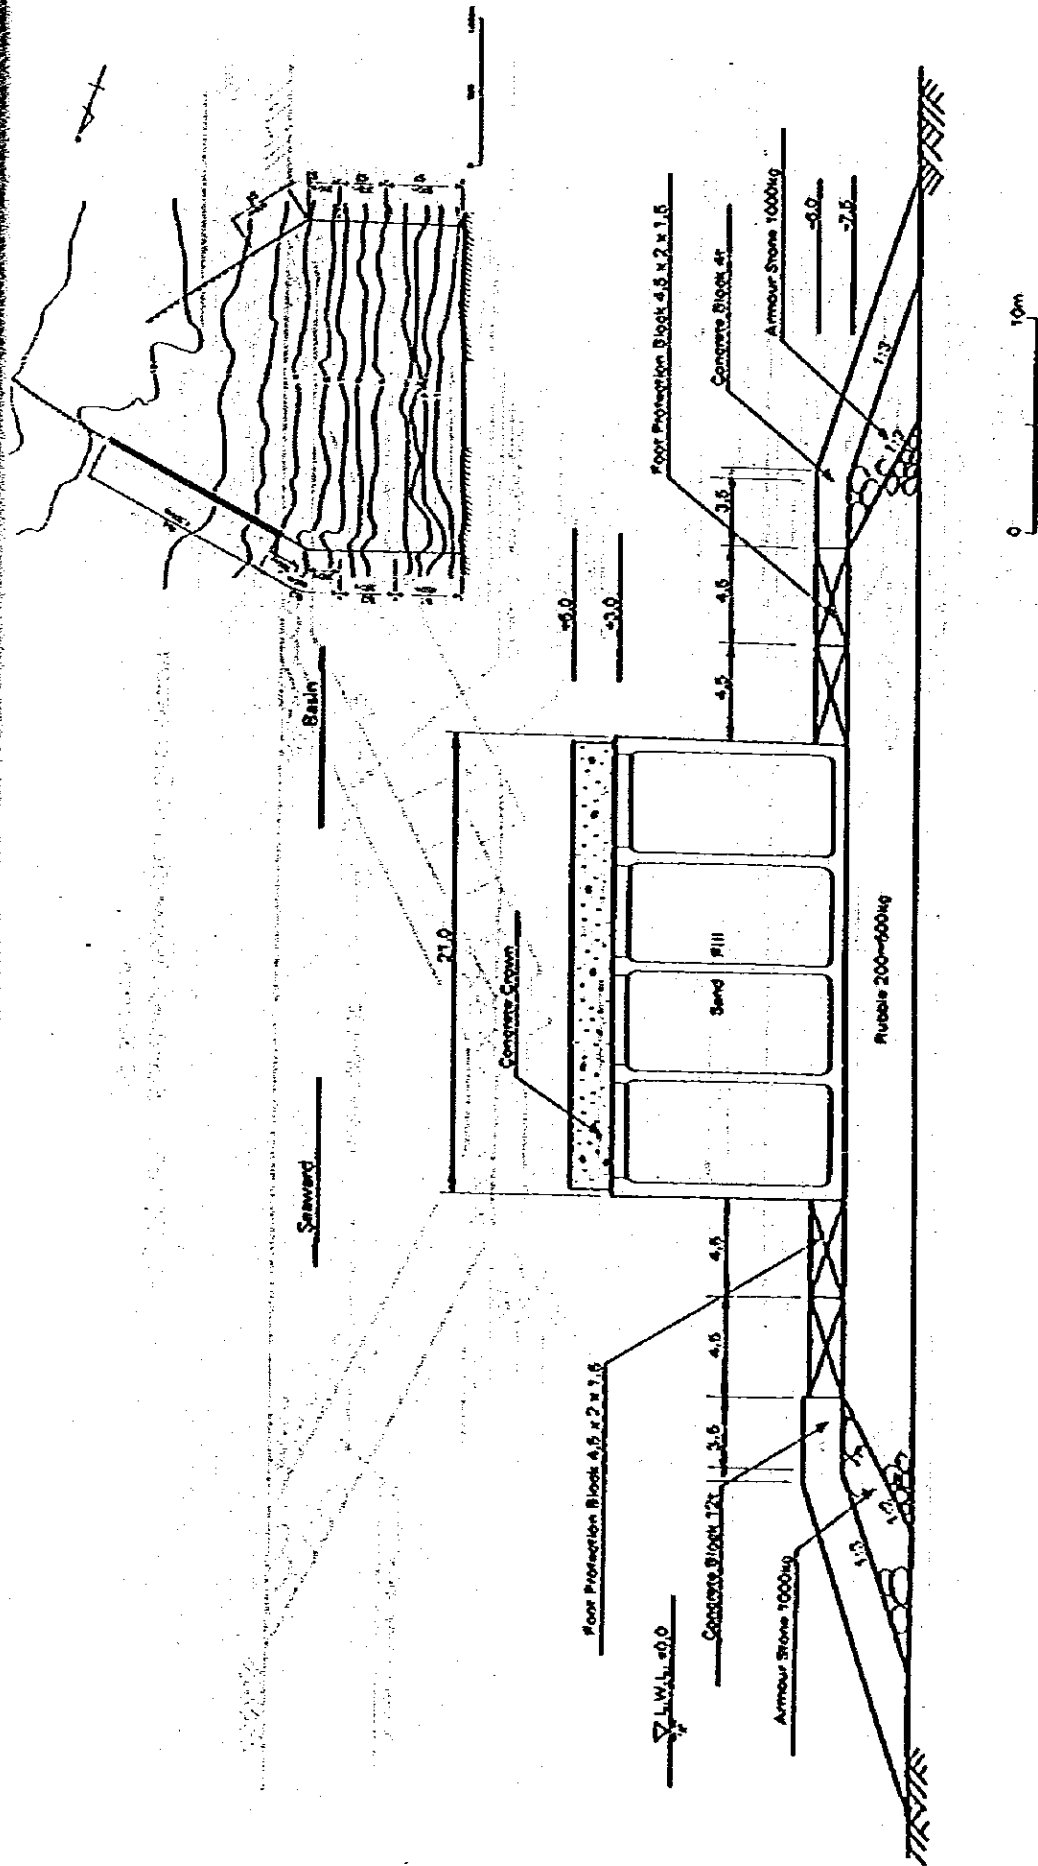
(5) Standard Crosssection of Breakwater (N4 Section)
